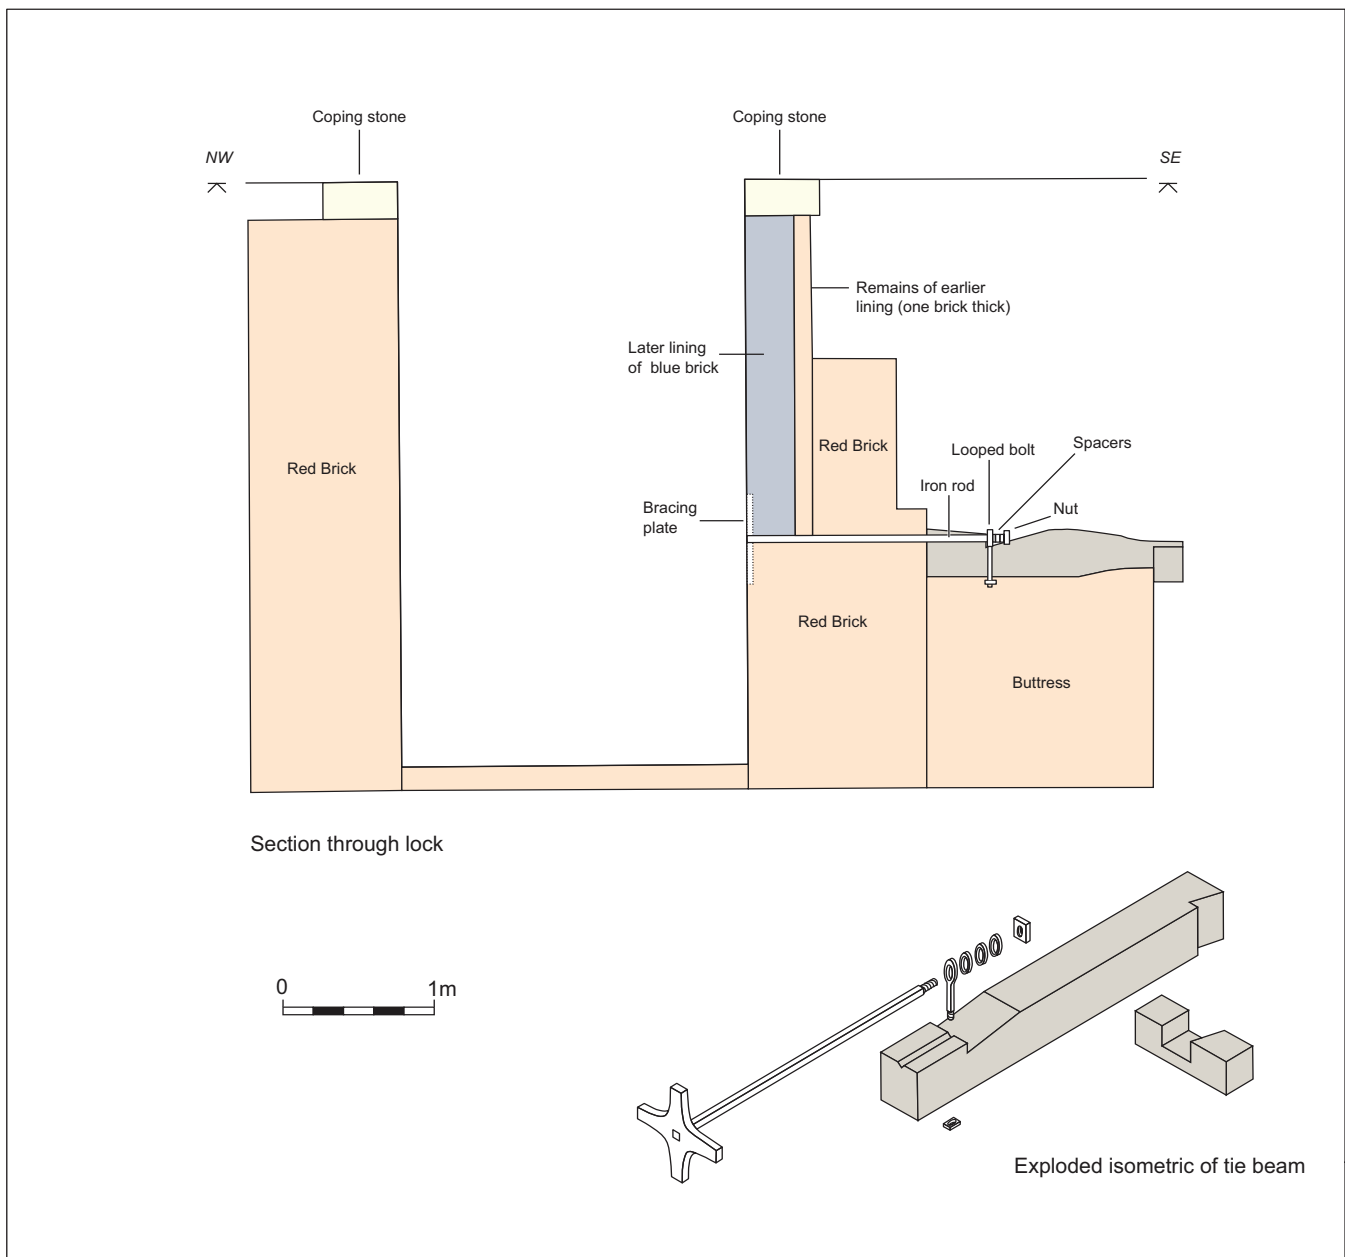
Cross-section of the lock chamber and tie beam, and exploded isometric of the tie beam
